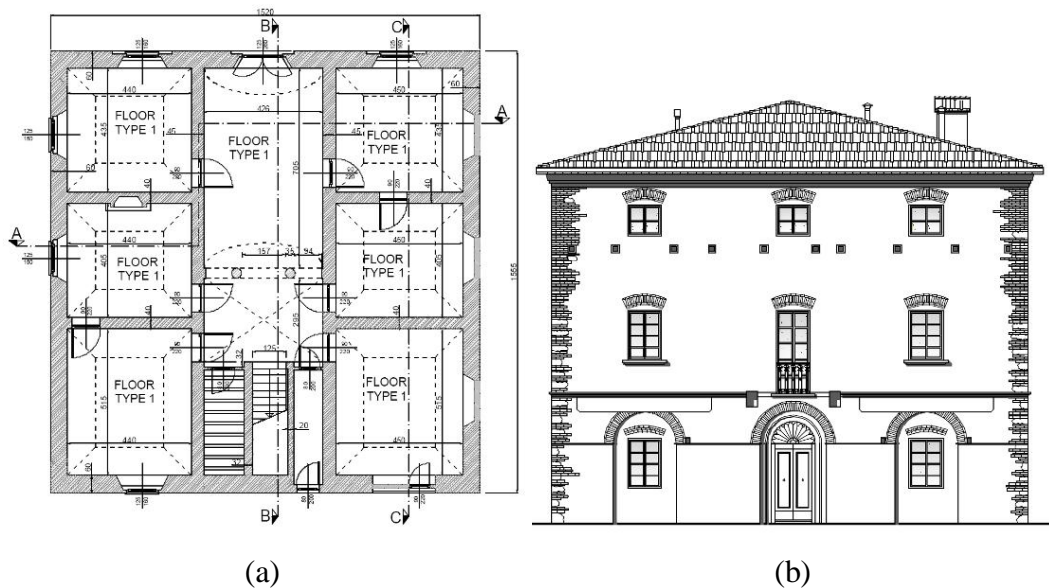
Ground floor section (a) and selected facade (b) of the building.
